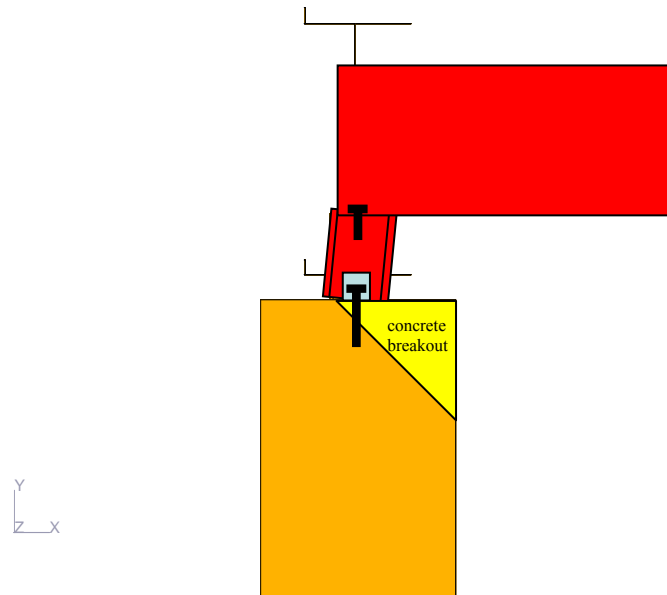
Side-view schematic of concrete breakout for anchors close to the edge of the reinforced concrete cap beam
